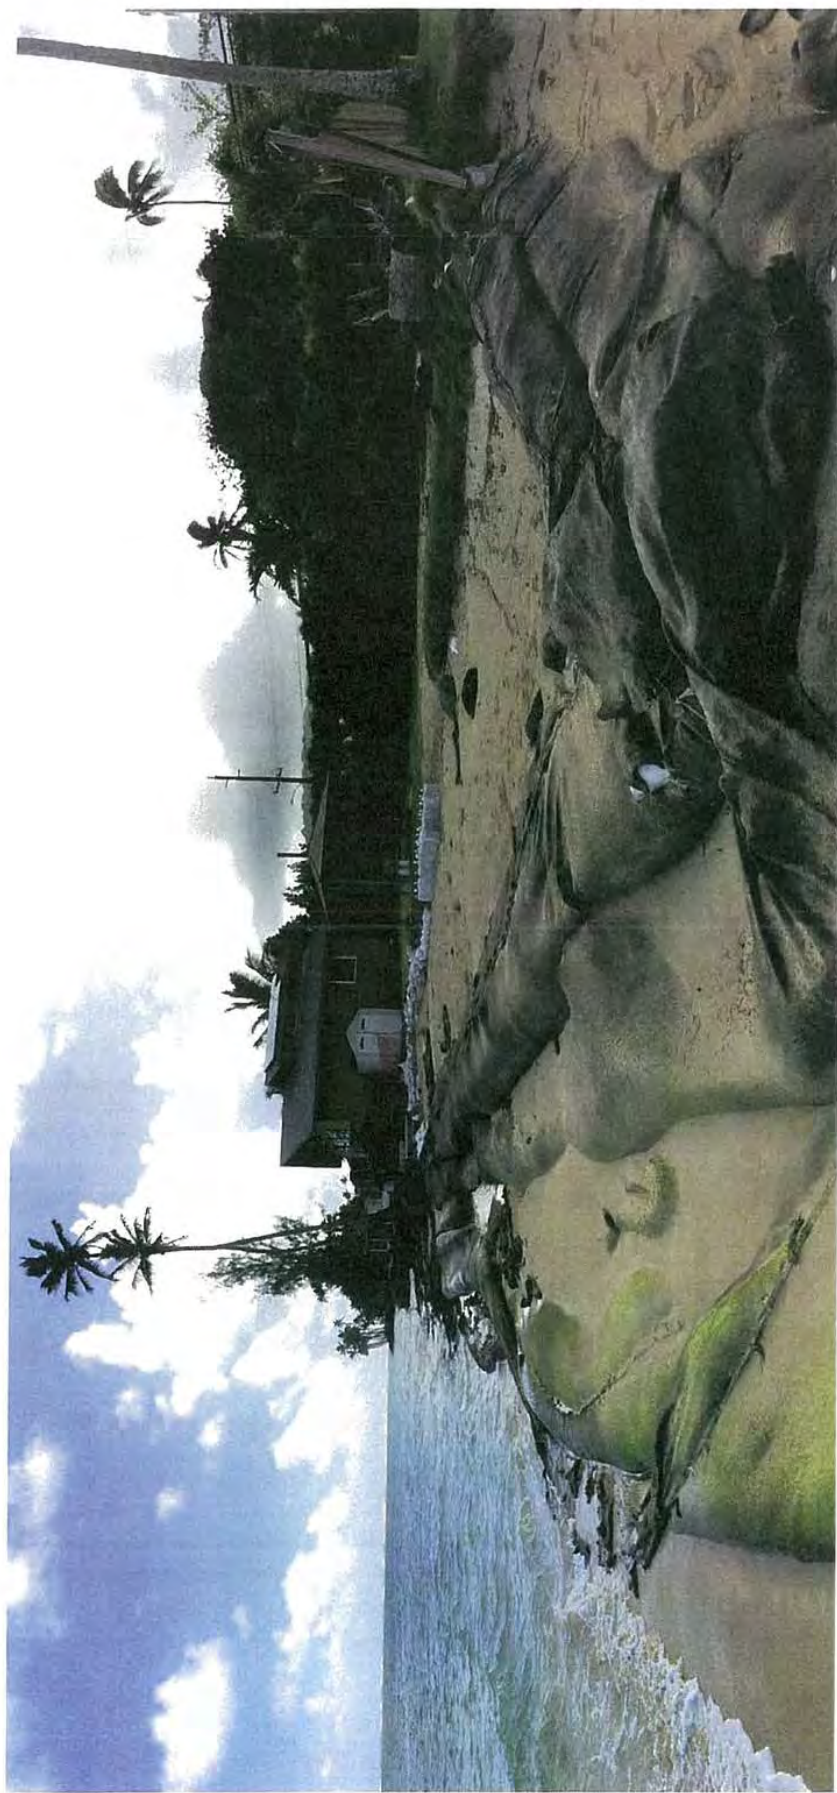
OCCL Staff Photo Taken 12/16/2021
